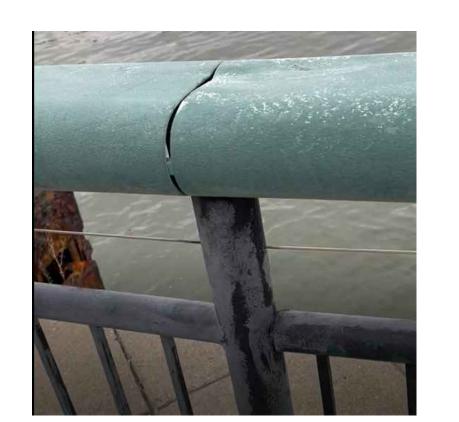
SOUTH PERIMETER HANDRAILS DEFORMED PIPE TOP RAIL NEAR FENDERS
